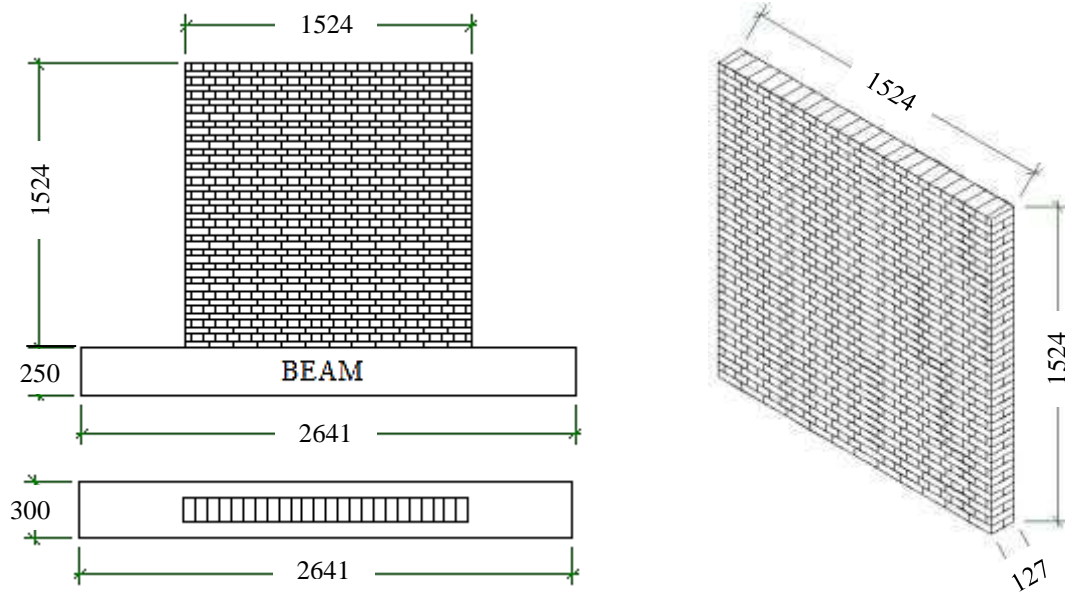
Detailed dimensions (in mm) of a typical wall sample (short wall)
